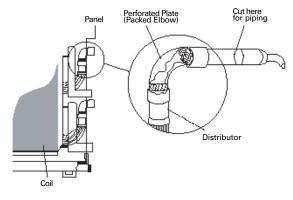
Refrigerant Coil with Packed Elbow
